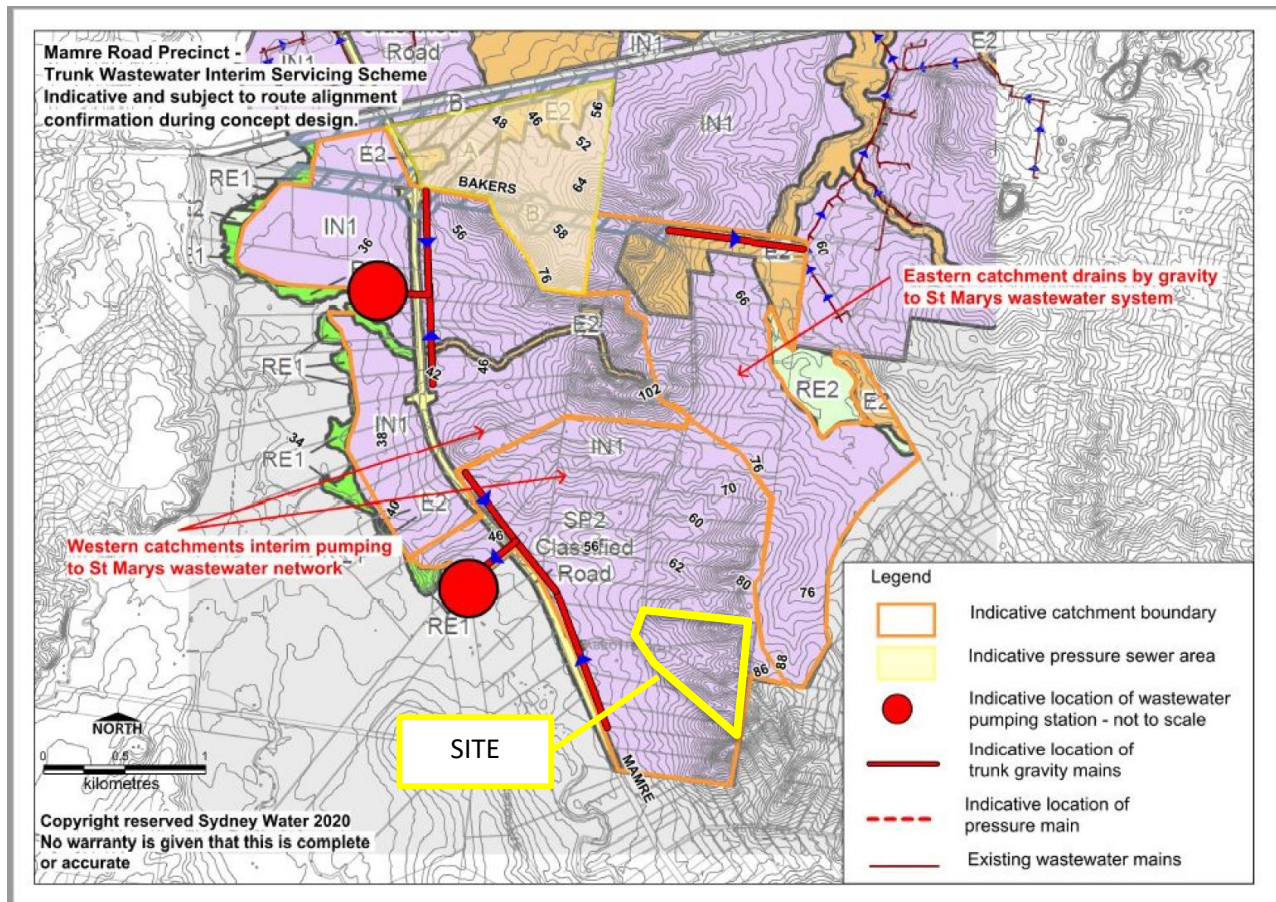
Indicative Wastewater servicing plan (Sydney Water)
